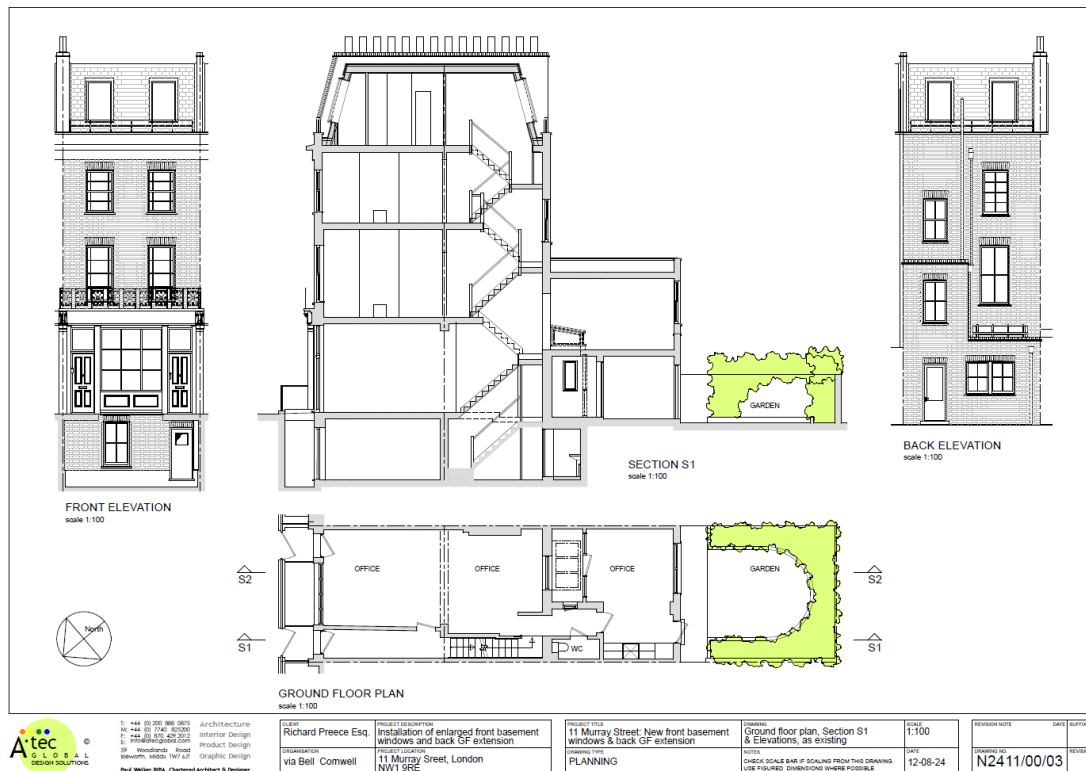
Existing floor plans, elevations and sections (Source: submitted drawings)
